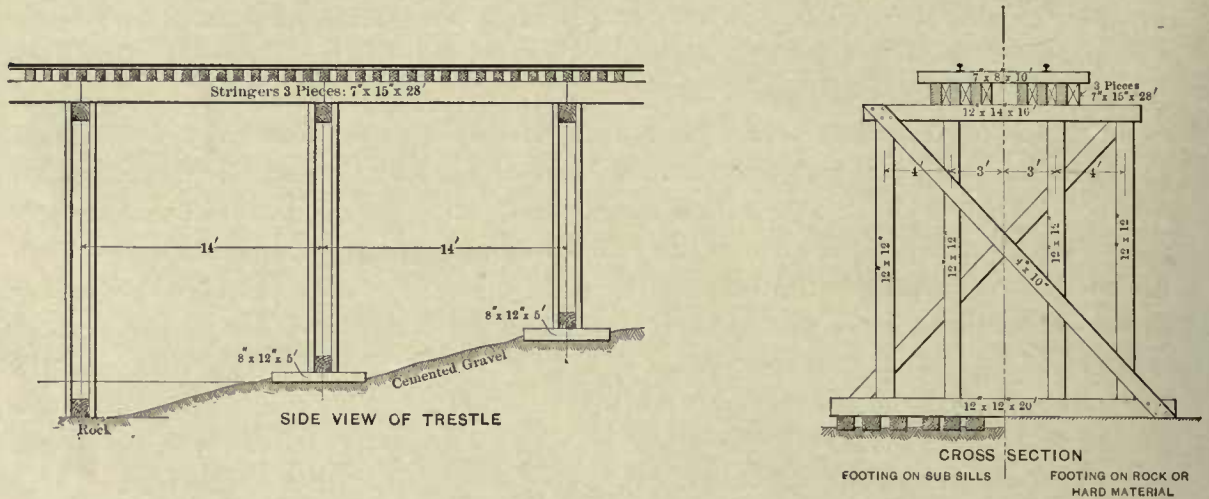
SKETCH OF FRAME TRESTLE FOR BRIDGING WASHOUT.
